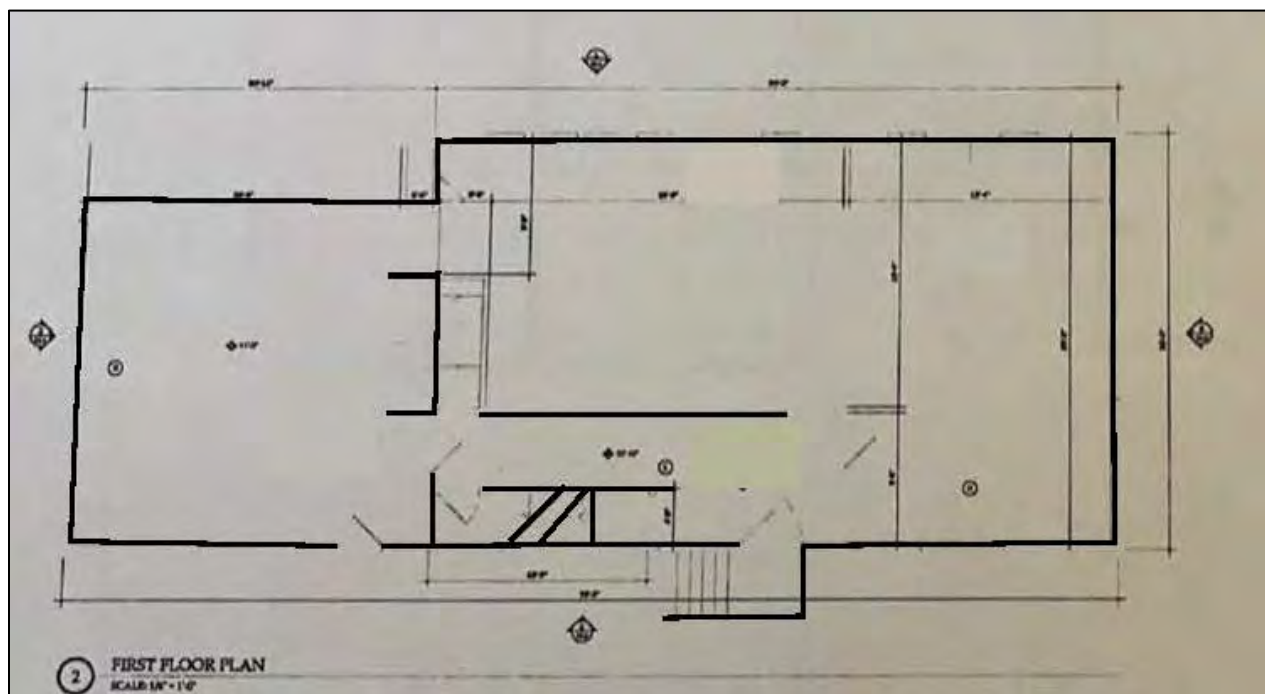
First floor plan of Union Street School, showing existing conditions (Plan by Karl Riedel Architecture, PC, 2018).
